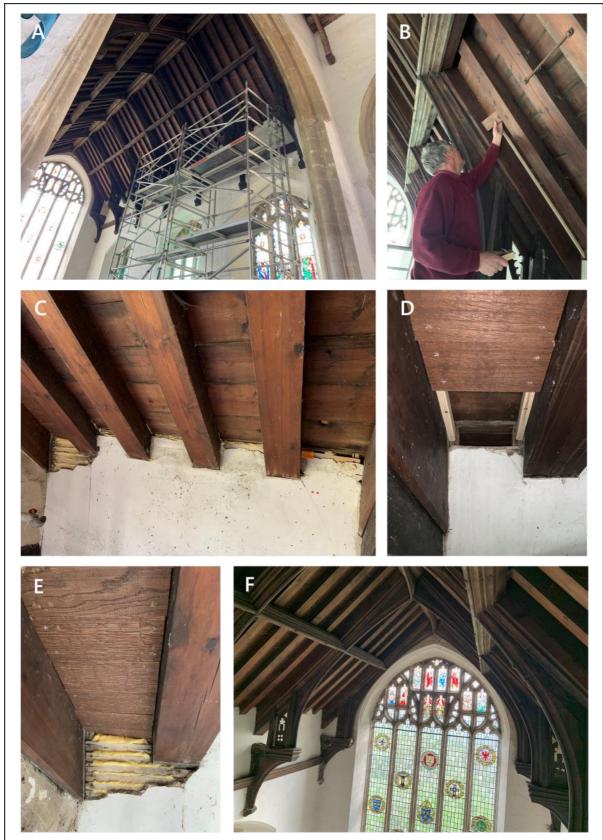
Photographs of interior works (chancel) – rafter bat boxes (south side) and blocking of gaps in plasterwork through to eaves roof void.
